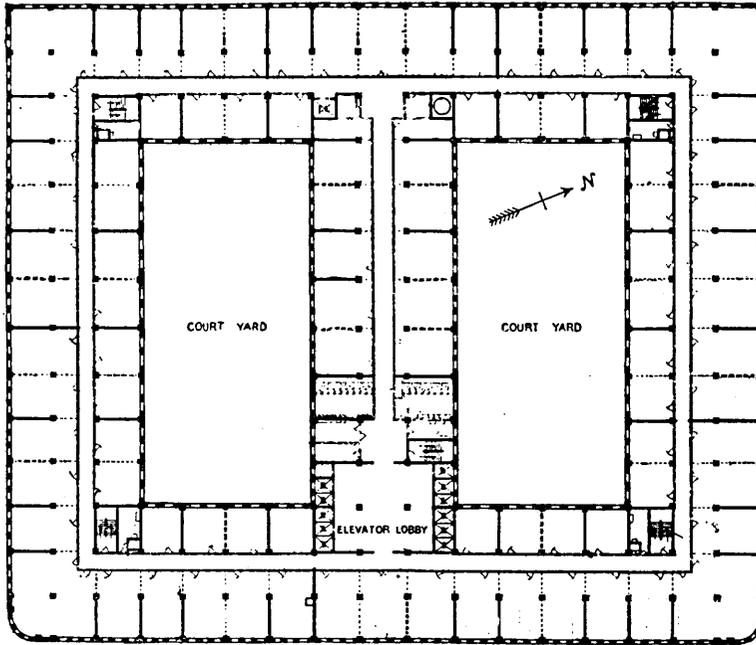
General Plan of the Second Floor. Scale 1/580.
